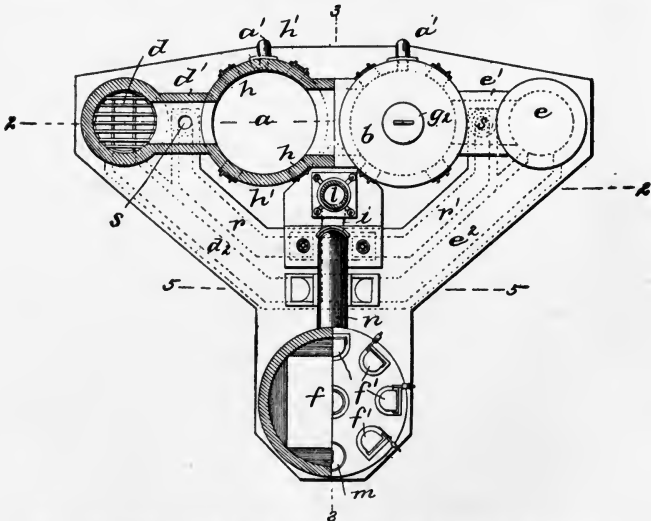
SMITH-SIEMENS GARBAGE FURNACE, PLAN.
